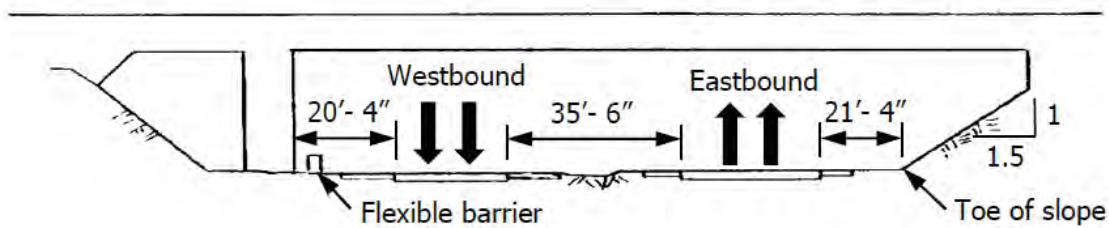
Bridge elevation view with two highway features below the bridge for a highway that is divided at the bridge (Example 4)
